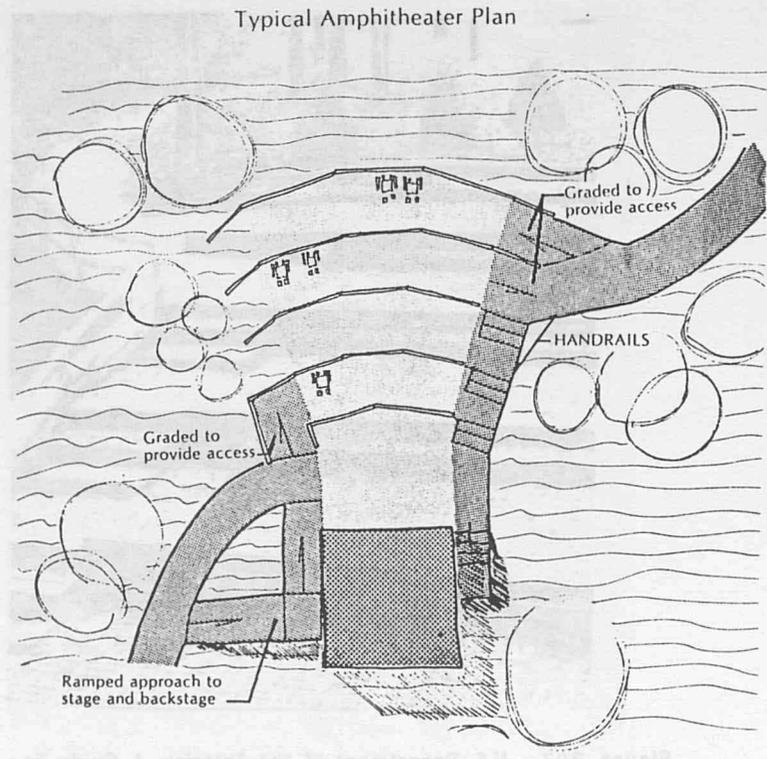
Typical outdoor theater. U.S. Department of the Interior, A Guide To Designing Accessible Outdoor Recreation Facilities, January 1980.
